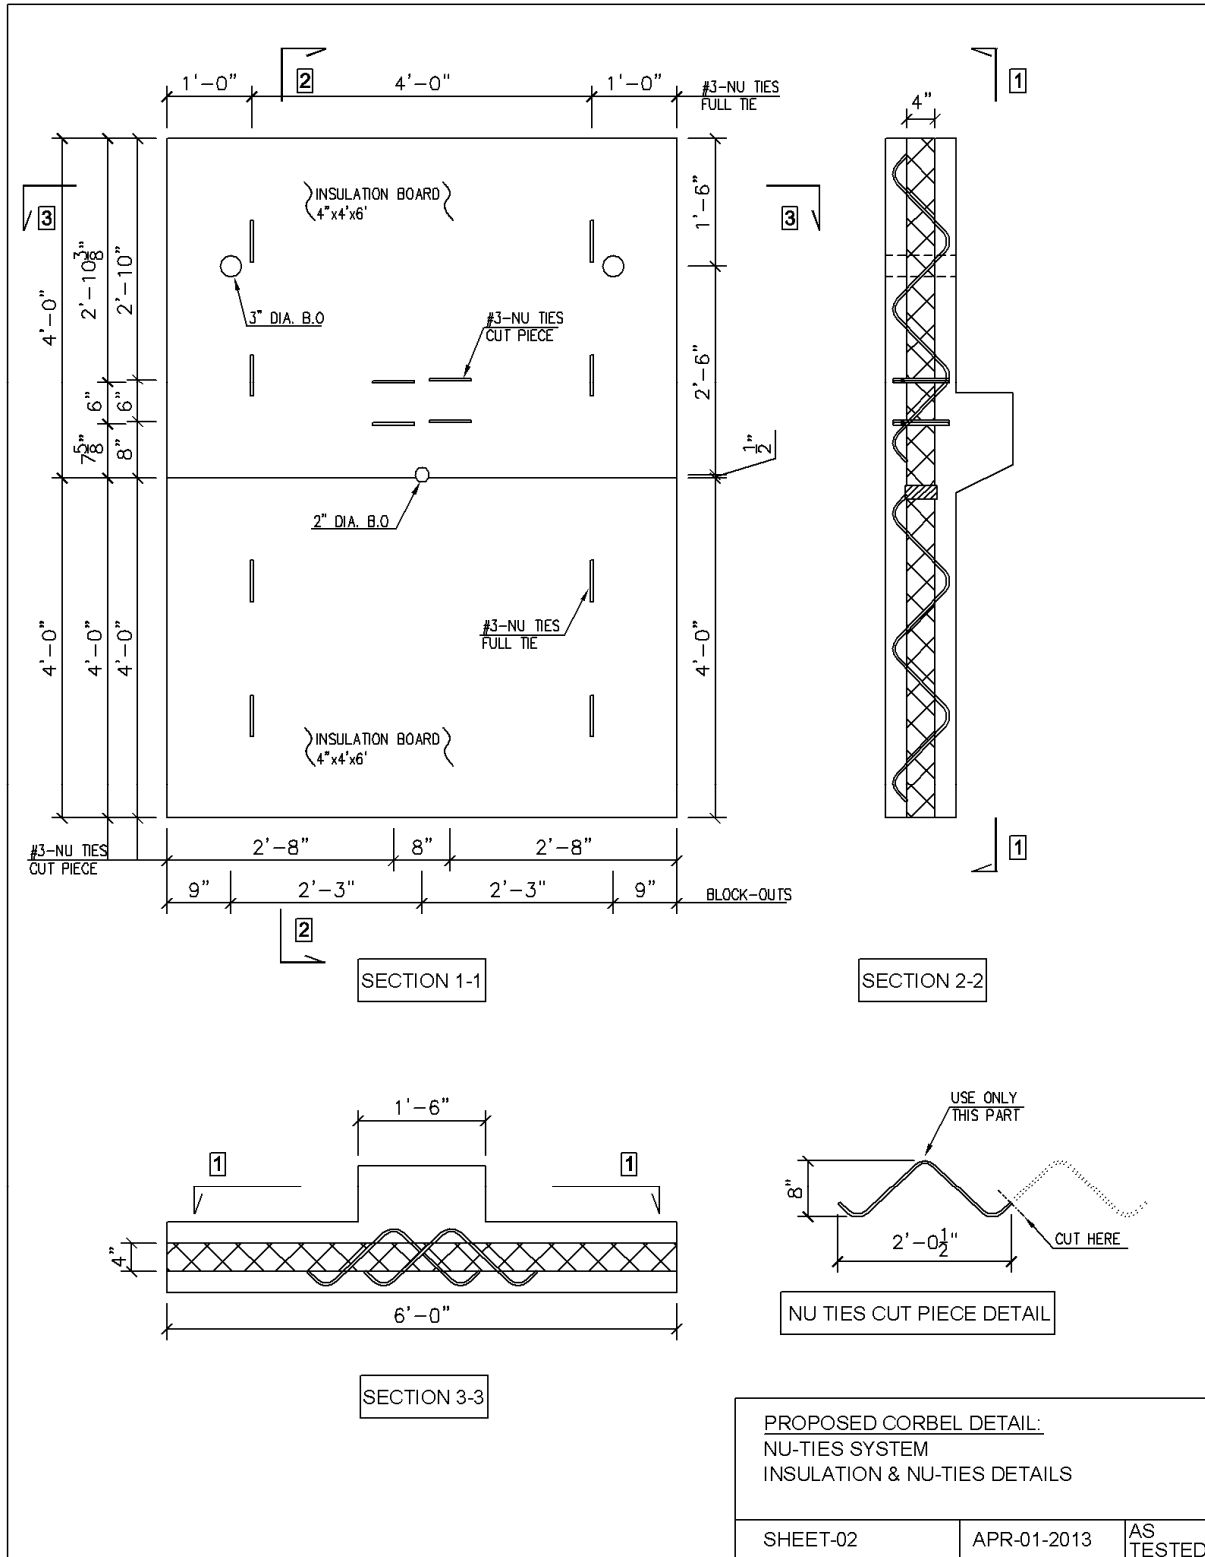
Specimen A3, A4 and A5- Details sheet 2
